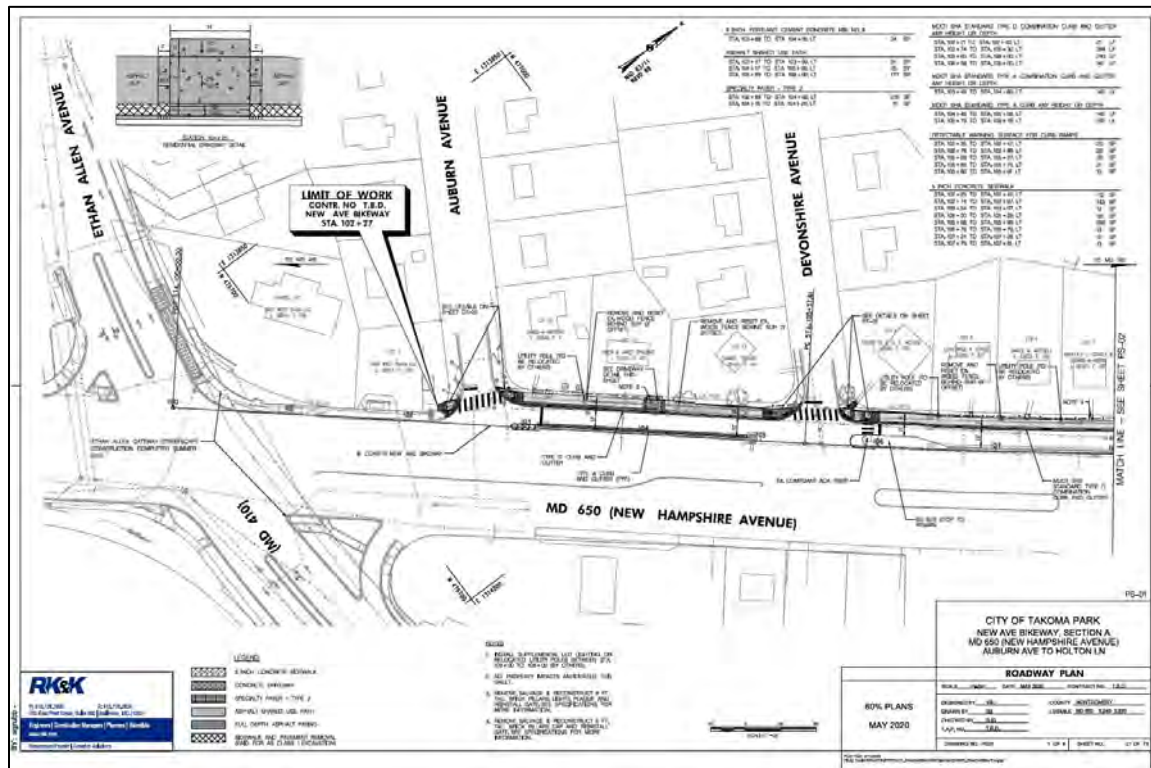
Plan View of Proposed New Avenue Section A Improvements (Part 1)
